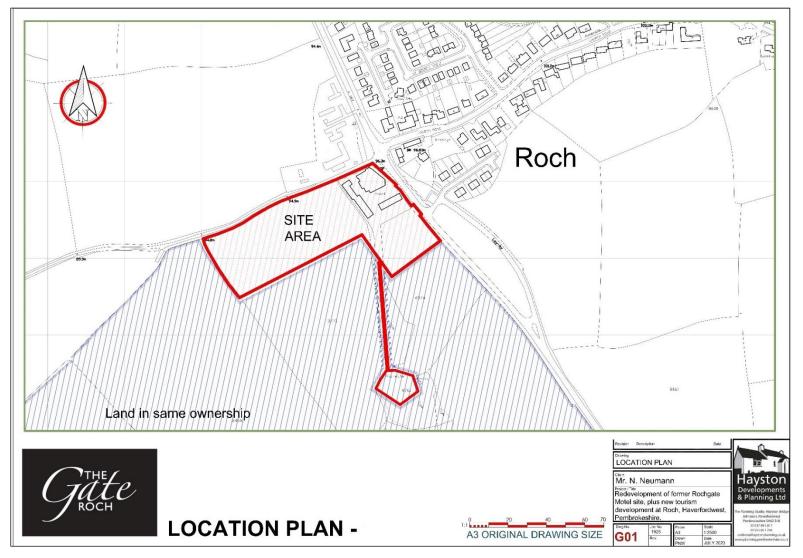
Detailed site and development location plan. Plan provided by the client, not reproduced to original scale.
